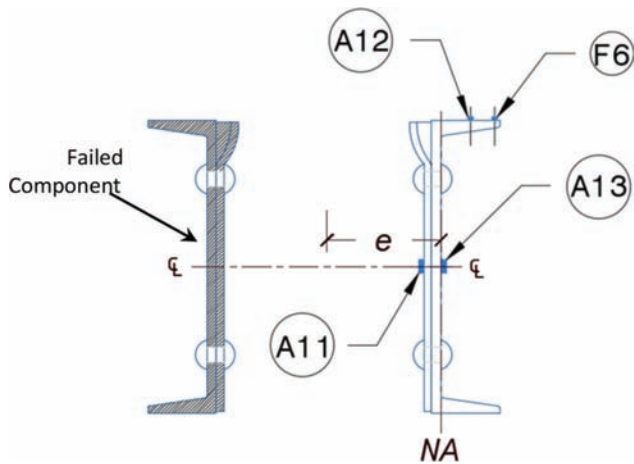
Cross sectional view of Winona Bridge Specimen 1, cut location “A.”
